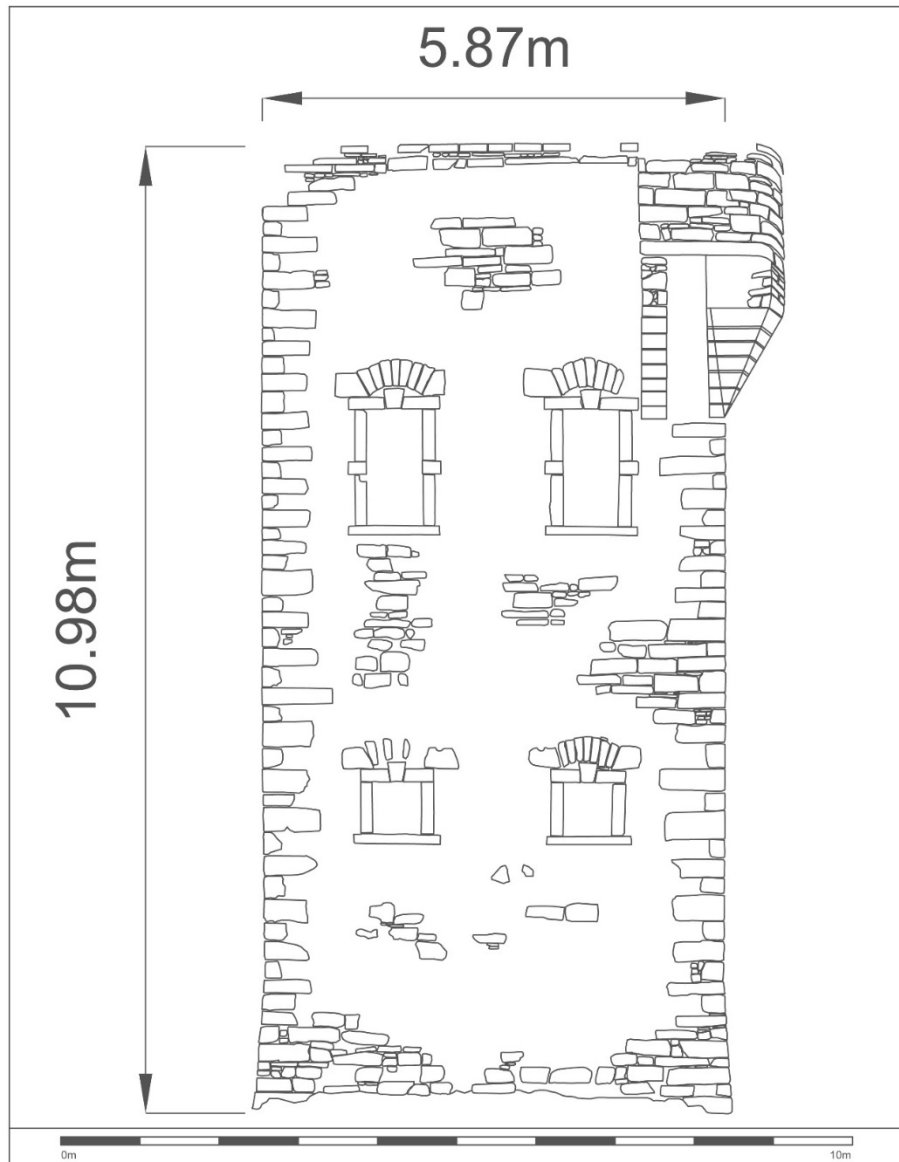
External elevation of the south-west wall of the signal tower at Glen Head Signal Station.
